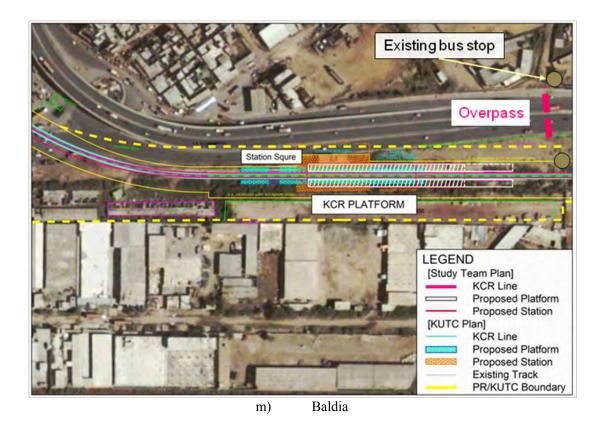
Provisional Station Plaza Plan (8/15)
